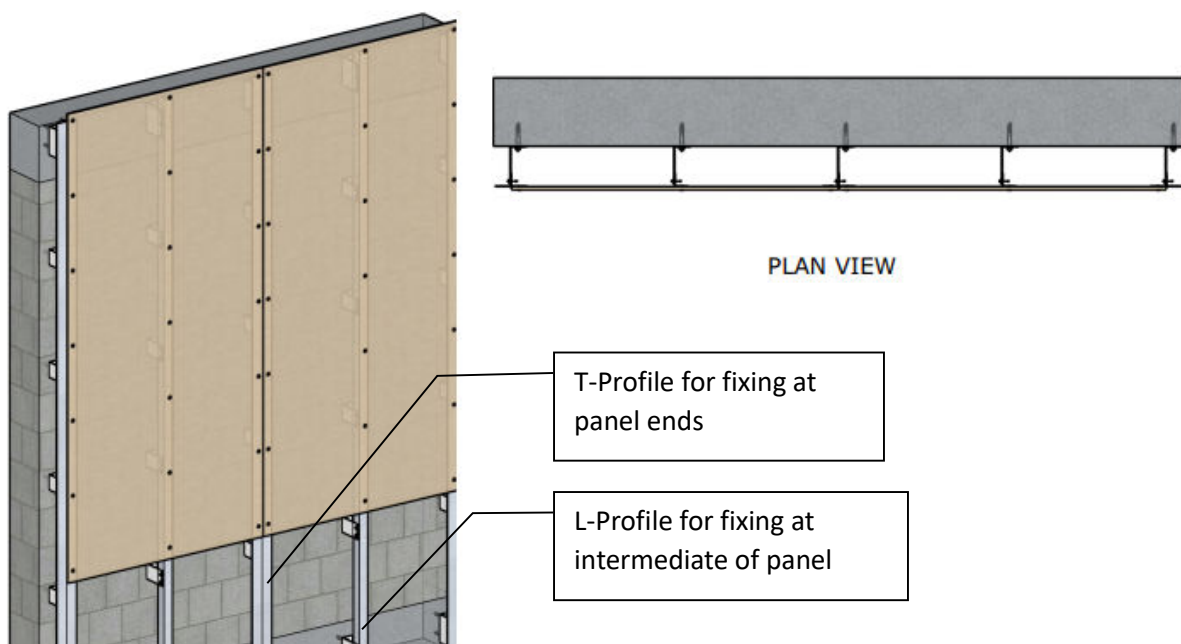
RIVET FIXING SYSTEM DETAILS
